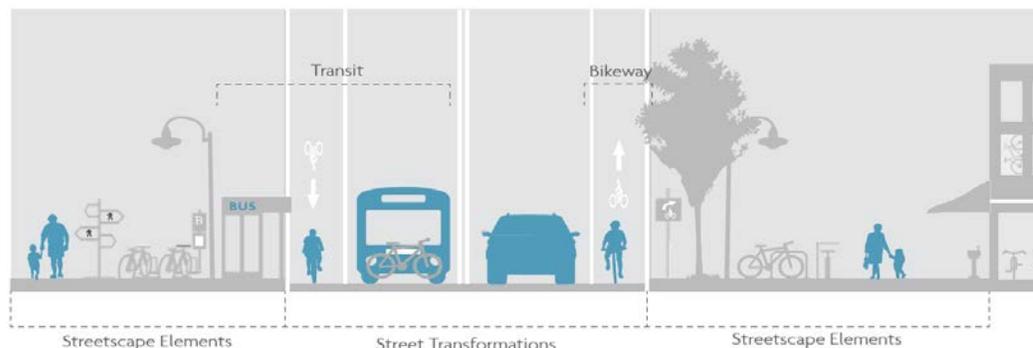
Possible streetscape elements and street transformations (West Palm Beach Mobility Plan)
